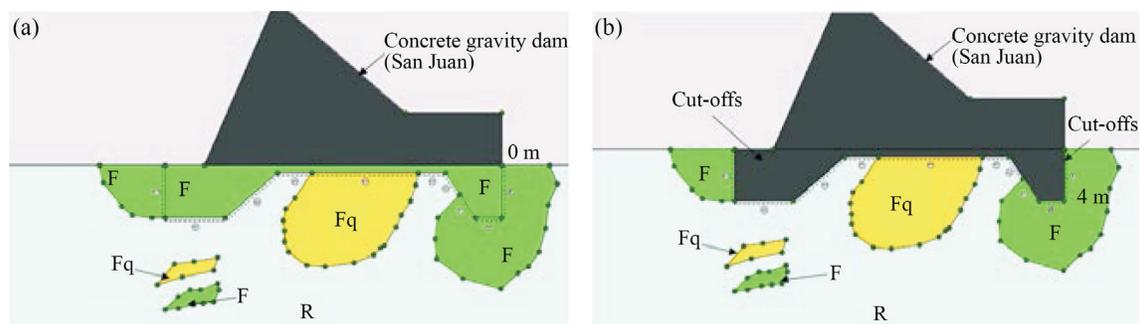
Modeling the foundation of Block 4 at elevation 0 m. Case 1 (a): no cut-offs, and, Case 2 (b): with concrete cut-offs excavated to elevation -4 m.
